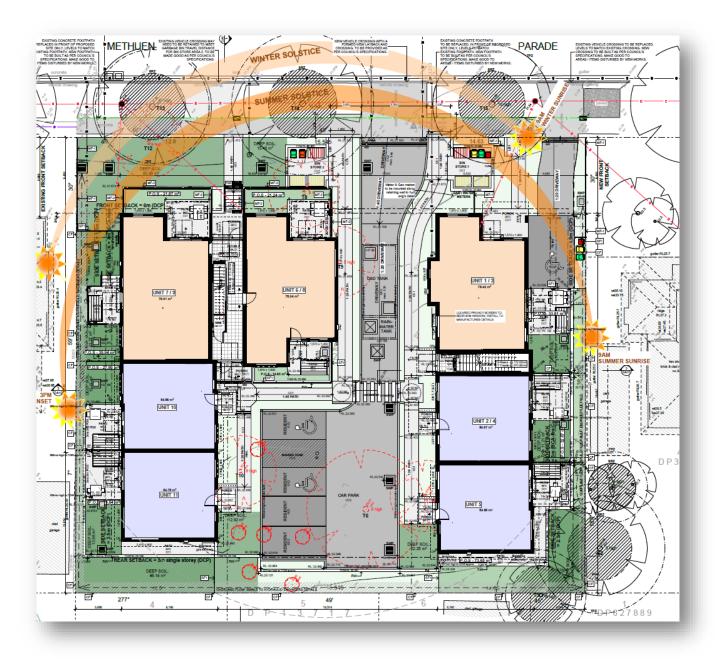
Extract from Architectural Plans – Site Plan (Source: Architectural Plans, DTA Architects, dated 23/06/2022)
